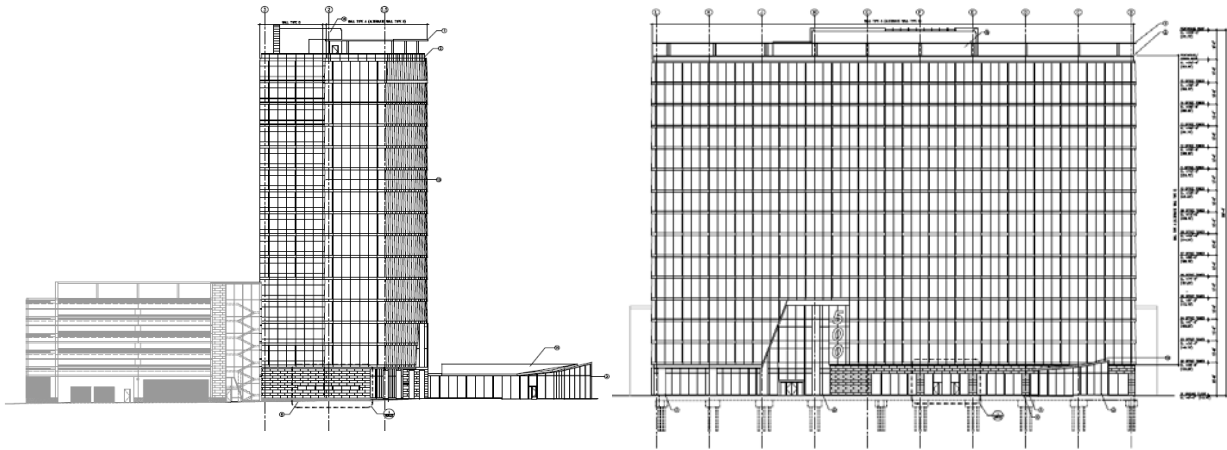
Front of side elevations of the office tower and parking garage. (Drawings courtesy of Gensler)
